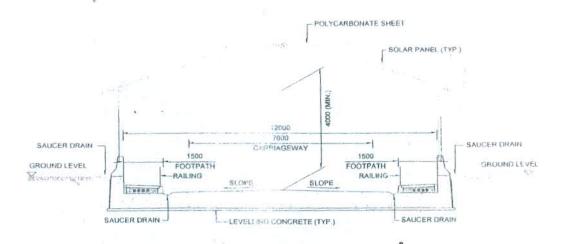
Typical Cross Section for Approach Start (Type-1)
